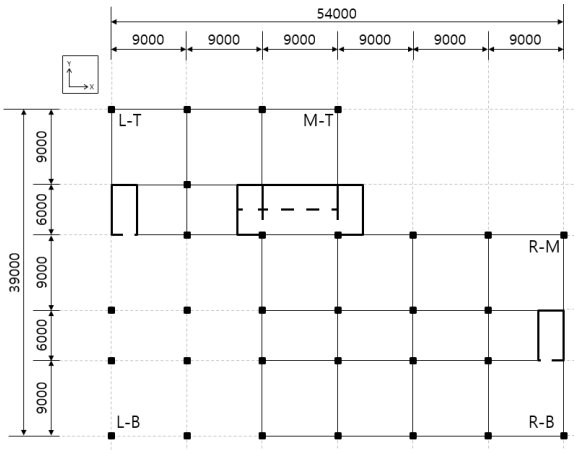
Second floor story plan of example building [15] (unit: mm)
